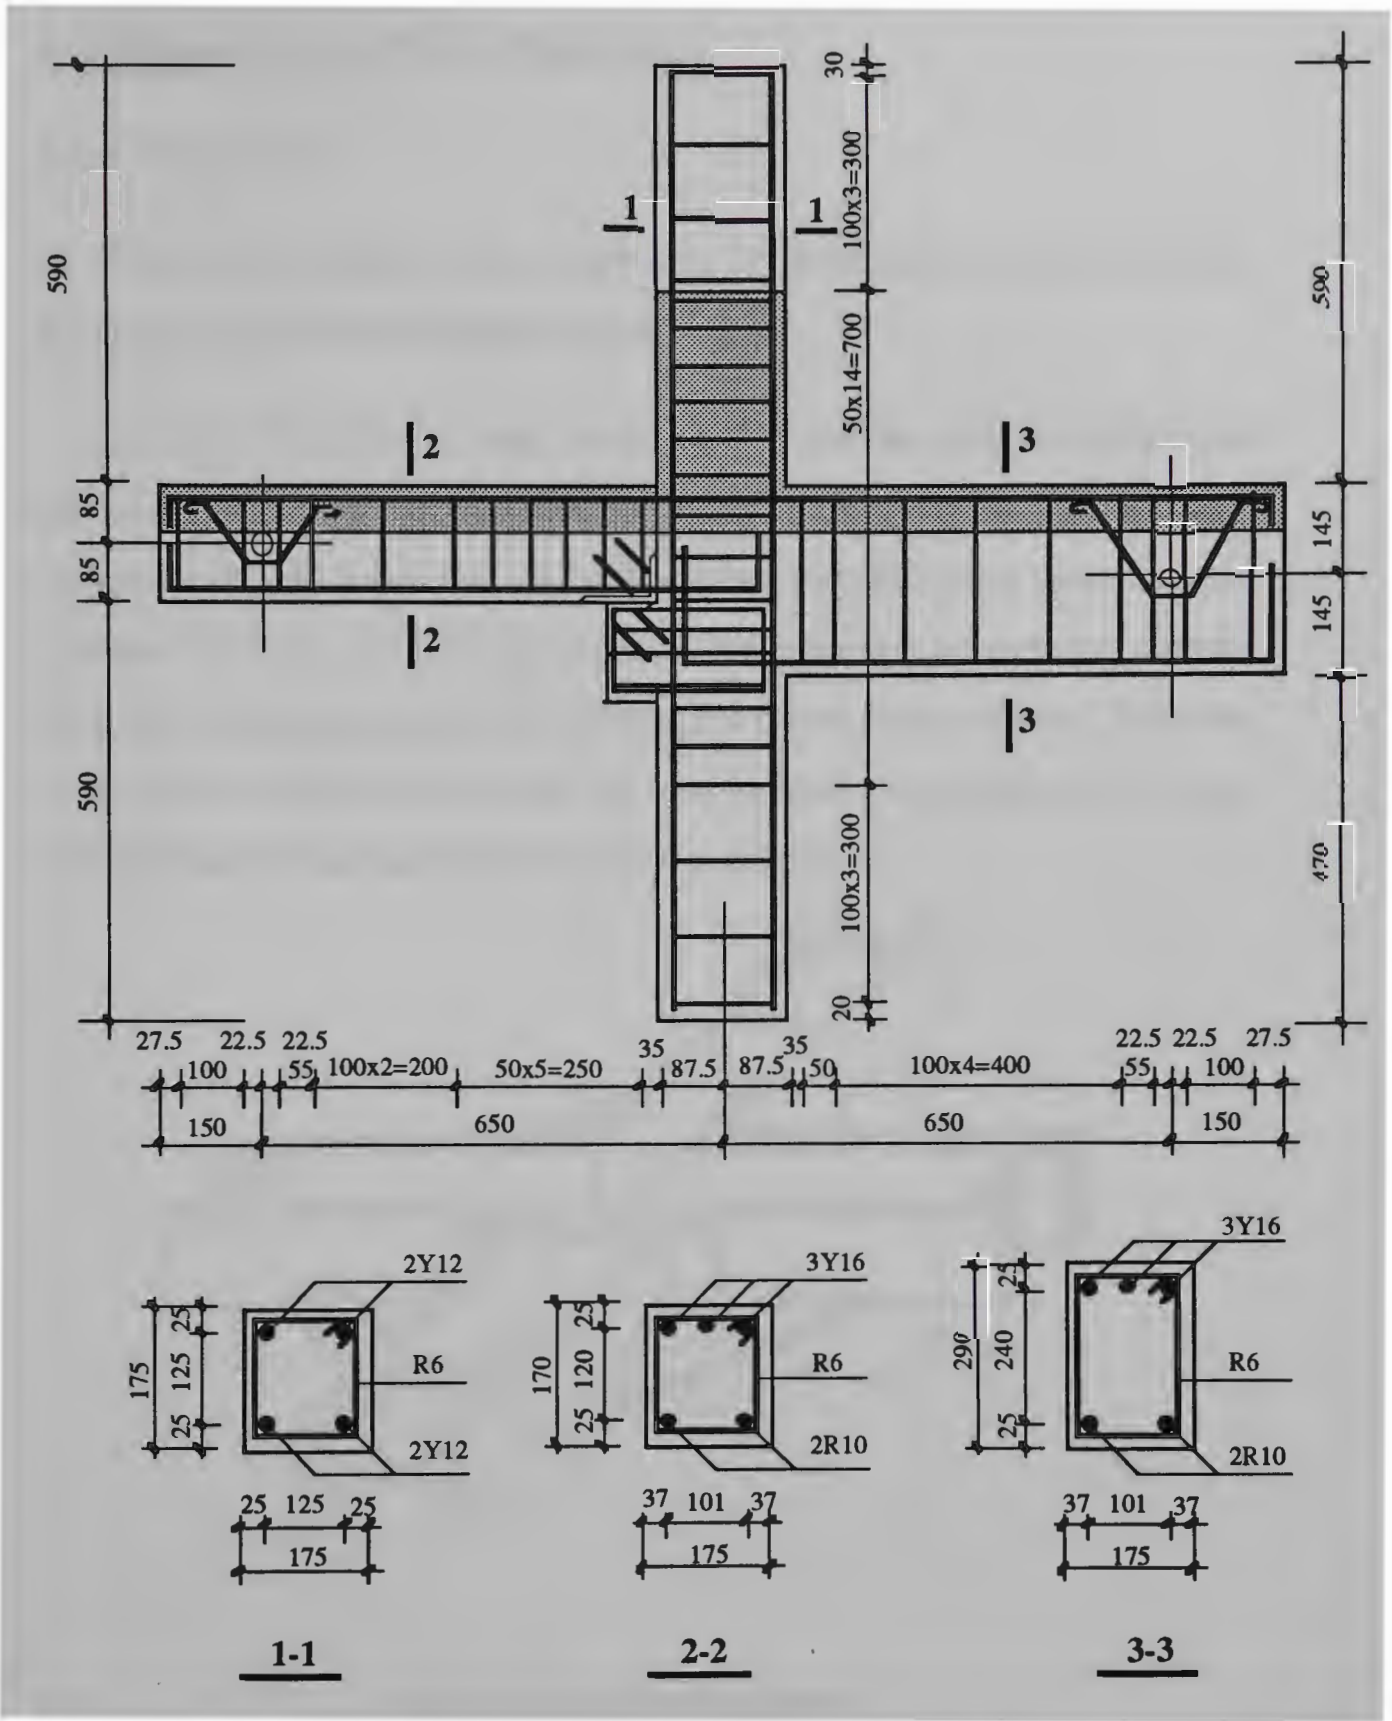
Detail of Specimens SPB2 & RPB2
